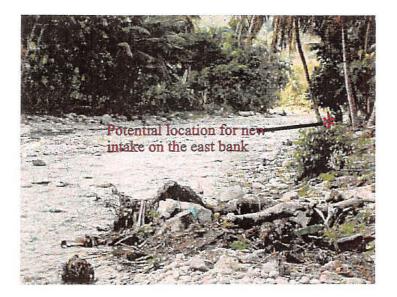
Potential location of a new intake site on the east bank of the river to avoid a river crossing structure. Location is determined by the elevation change in the river which should be high enough for gravity supply to the undamaged section of the main canal. The new connecting section may be routed near the foothill to avoid future damage by flooding or bank erosion.
